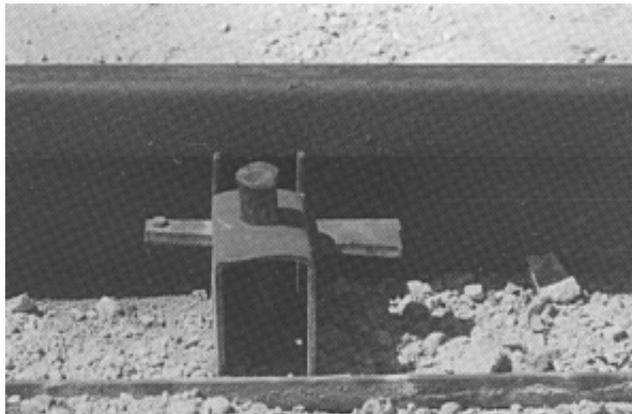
The arrow points to the form sliding end piece for locking together adjoining forms.
